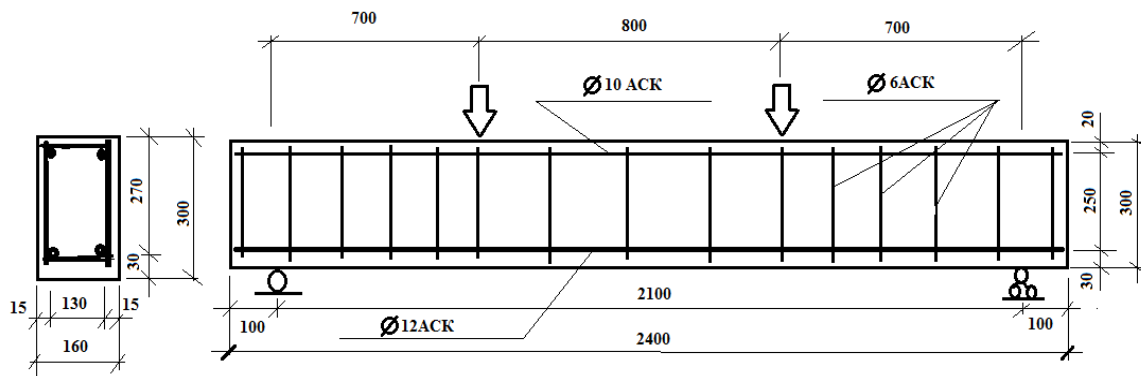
Reinforcement, loading schemes and basic dimensions of sample beams
